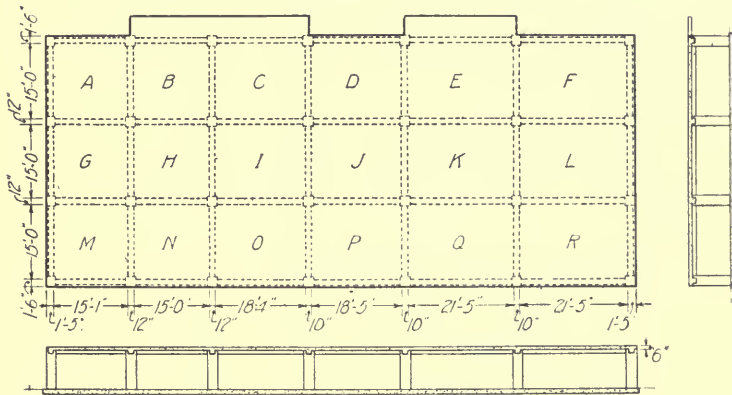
PLAN OF FLOOR SLAB TESTED AT WAYNESBURG, OHIO; THICKNESS, 6 IN.
